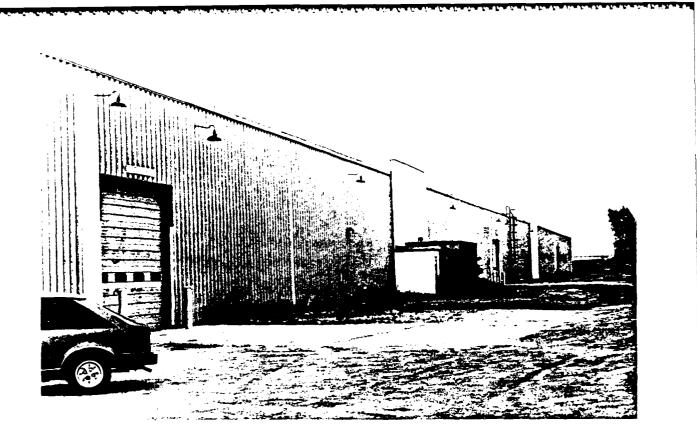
West elevation of the steel-framed, metal-clad controlled humidity warehouse (Building 1) at the Pontiac Storage Facility. (Source: Field inventory photograph, 1983, Larry Lankton, Building Technology, Inc.)
